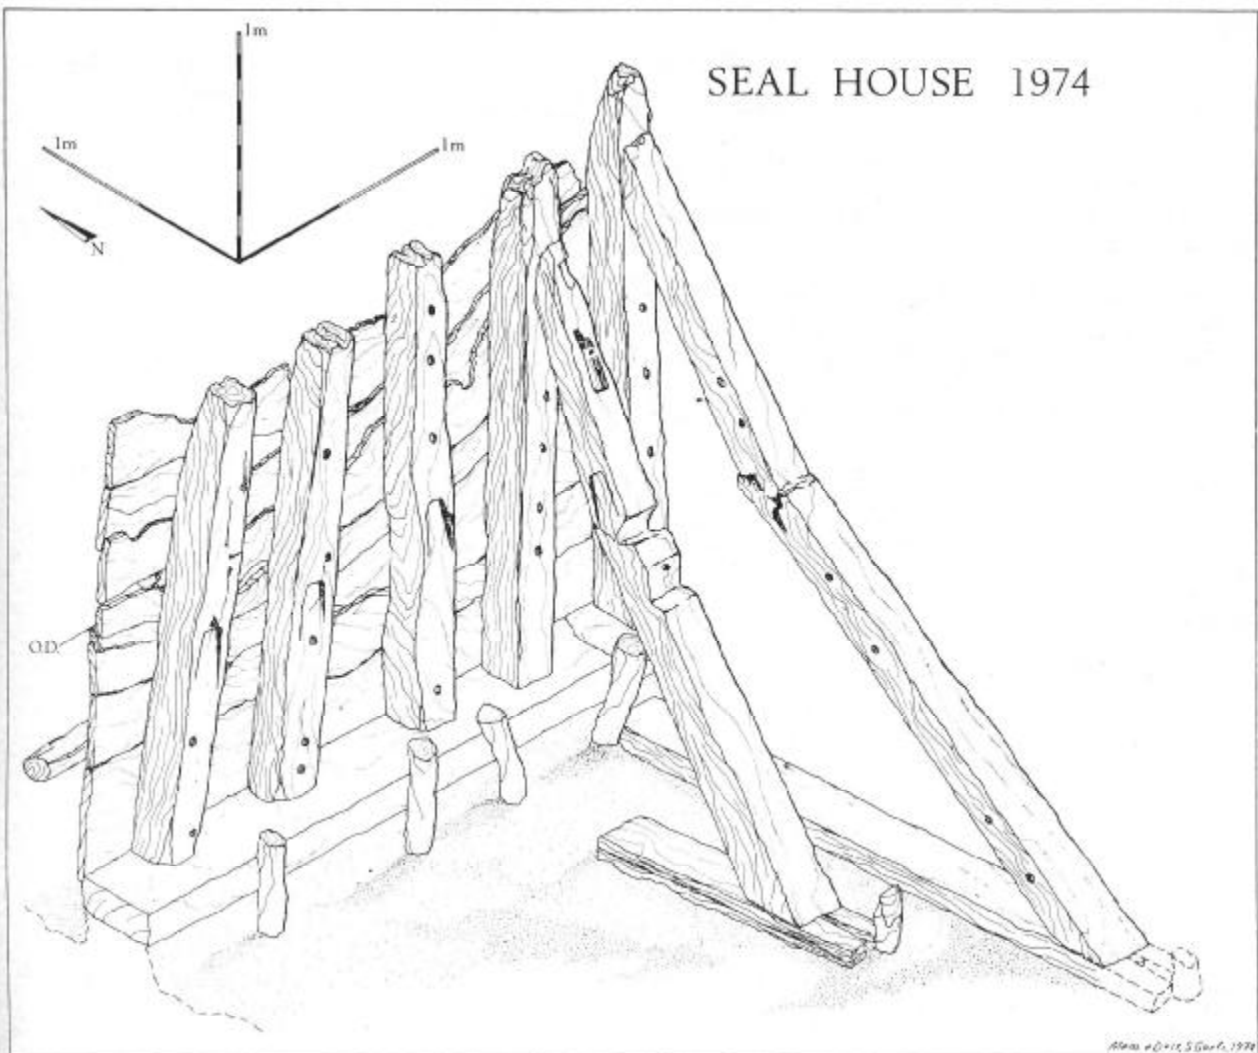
Isometric drawing of Waterfront III, Seal House.
